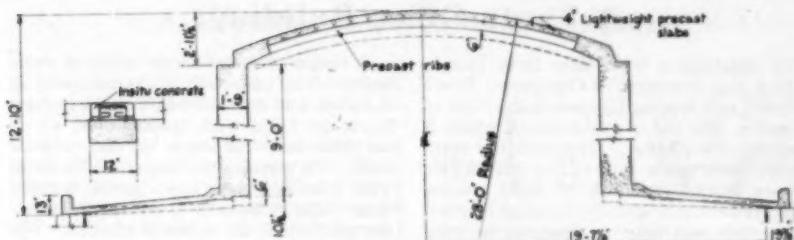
Cross Section through Roof and Detail of Precast Rib.
